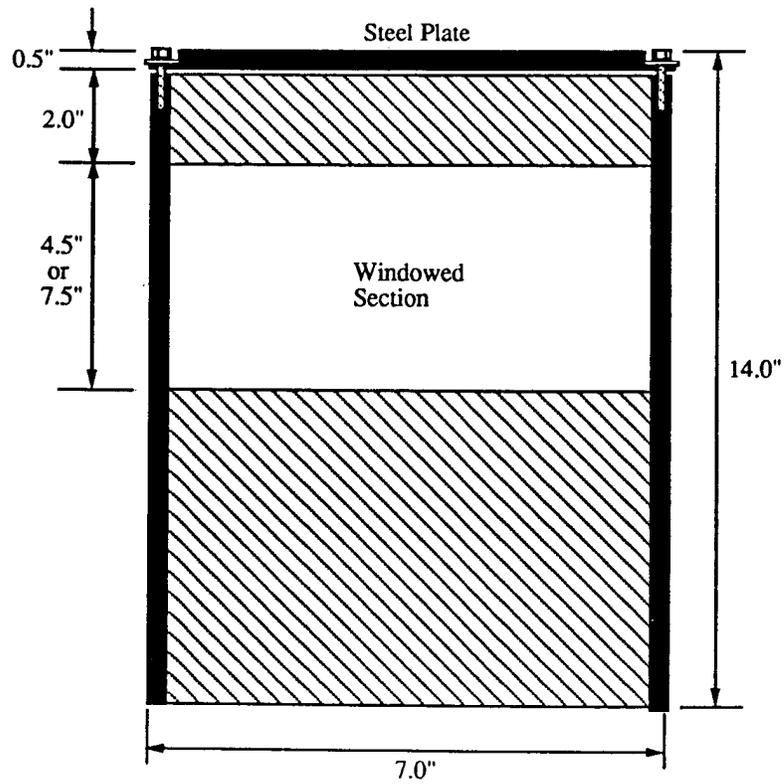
(b) Instrumentation Box for Slab Edge Joint Single Layer Deflectometer (Side View B)
